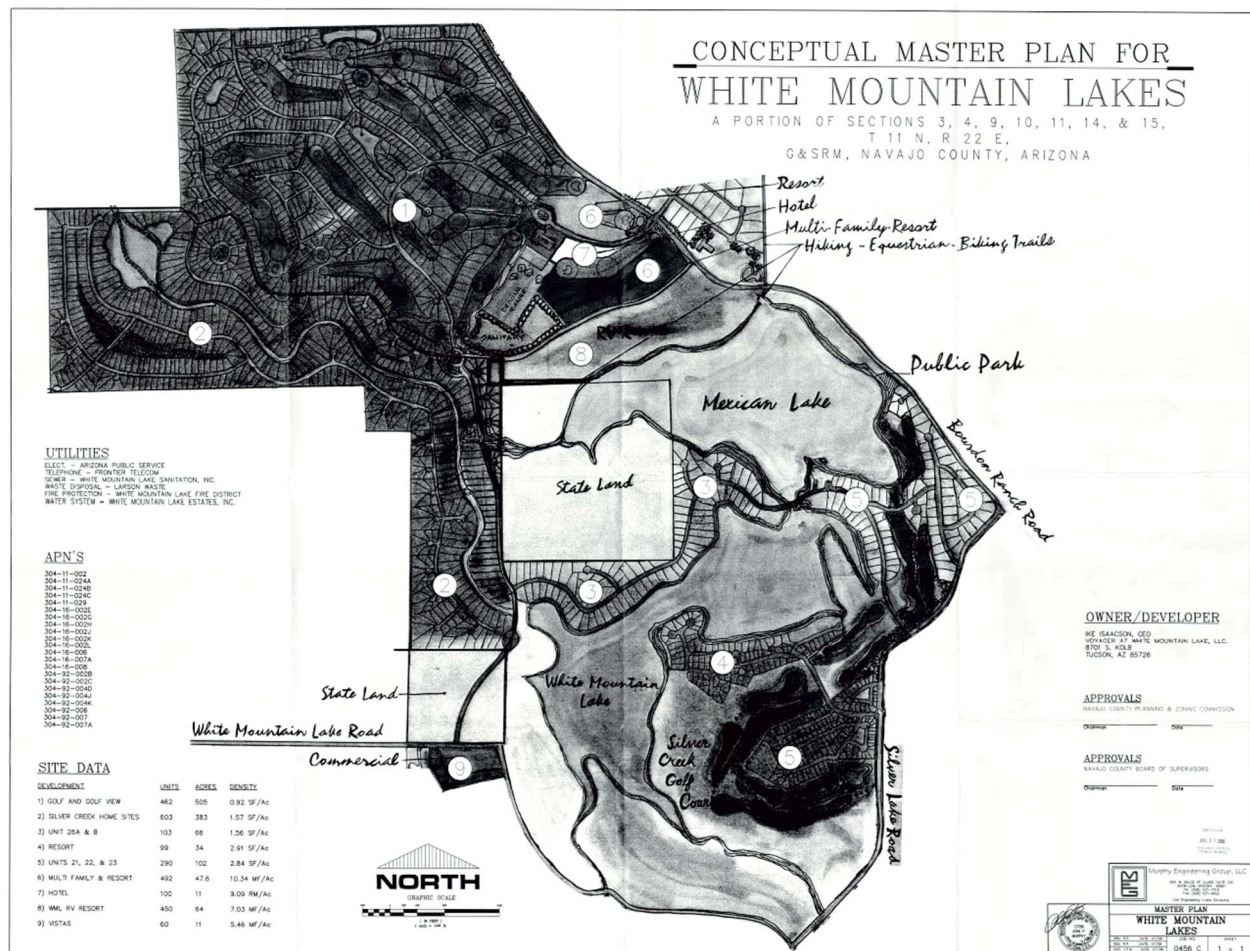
EXISTING MASTER DEVELOPMENT PLAN
